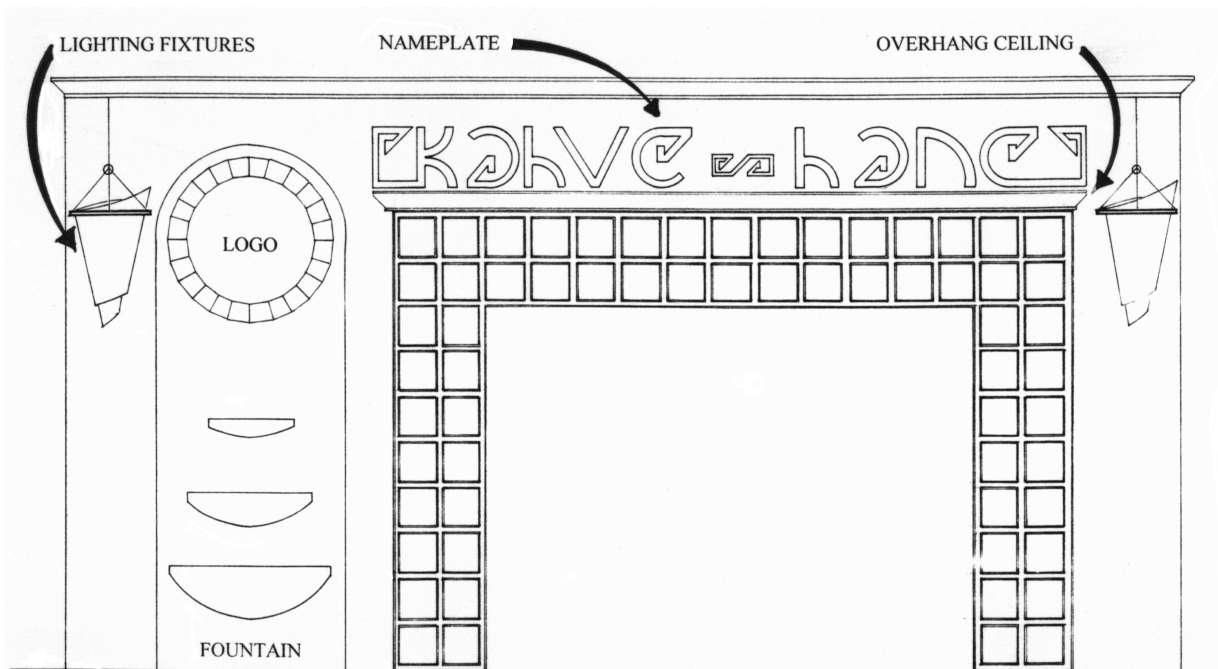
Front view of proposed store facade with logo, nameplate, fountain, ceiling, window, and lighting fixture designs.
